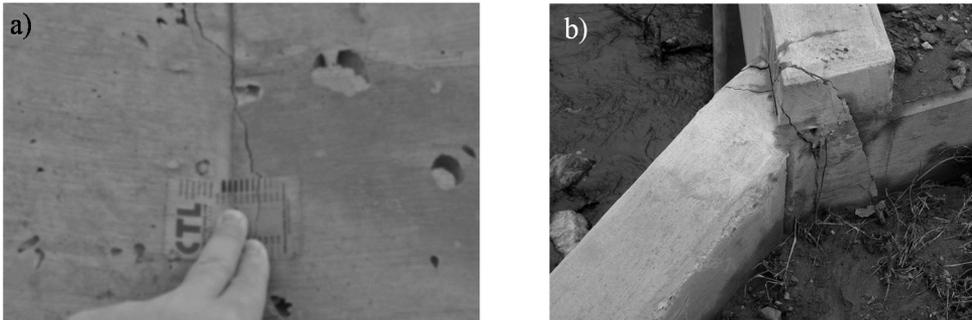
Culvert distress a) Centerville, AL; b) AL 49 near Dadeville, AL
